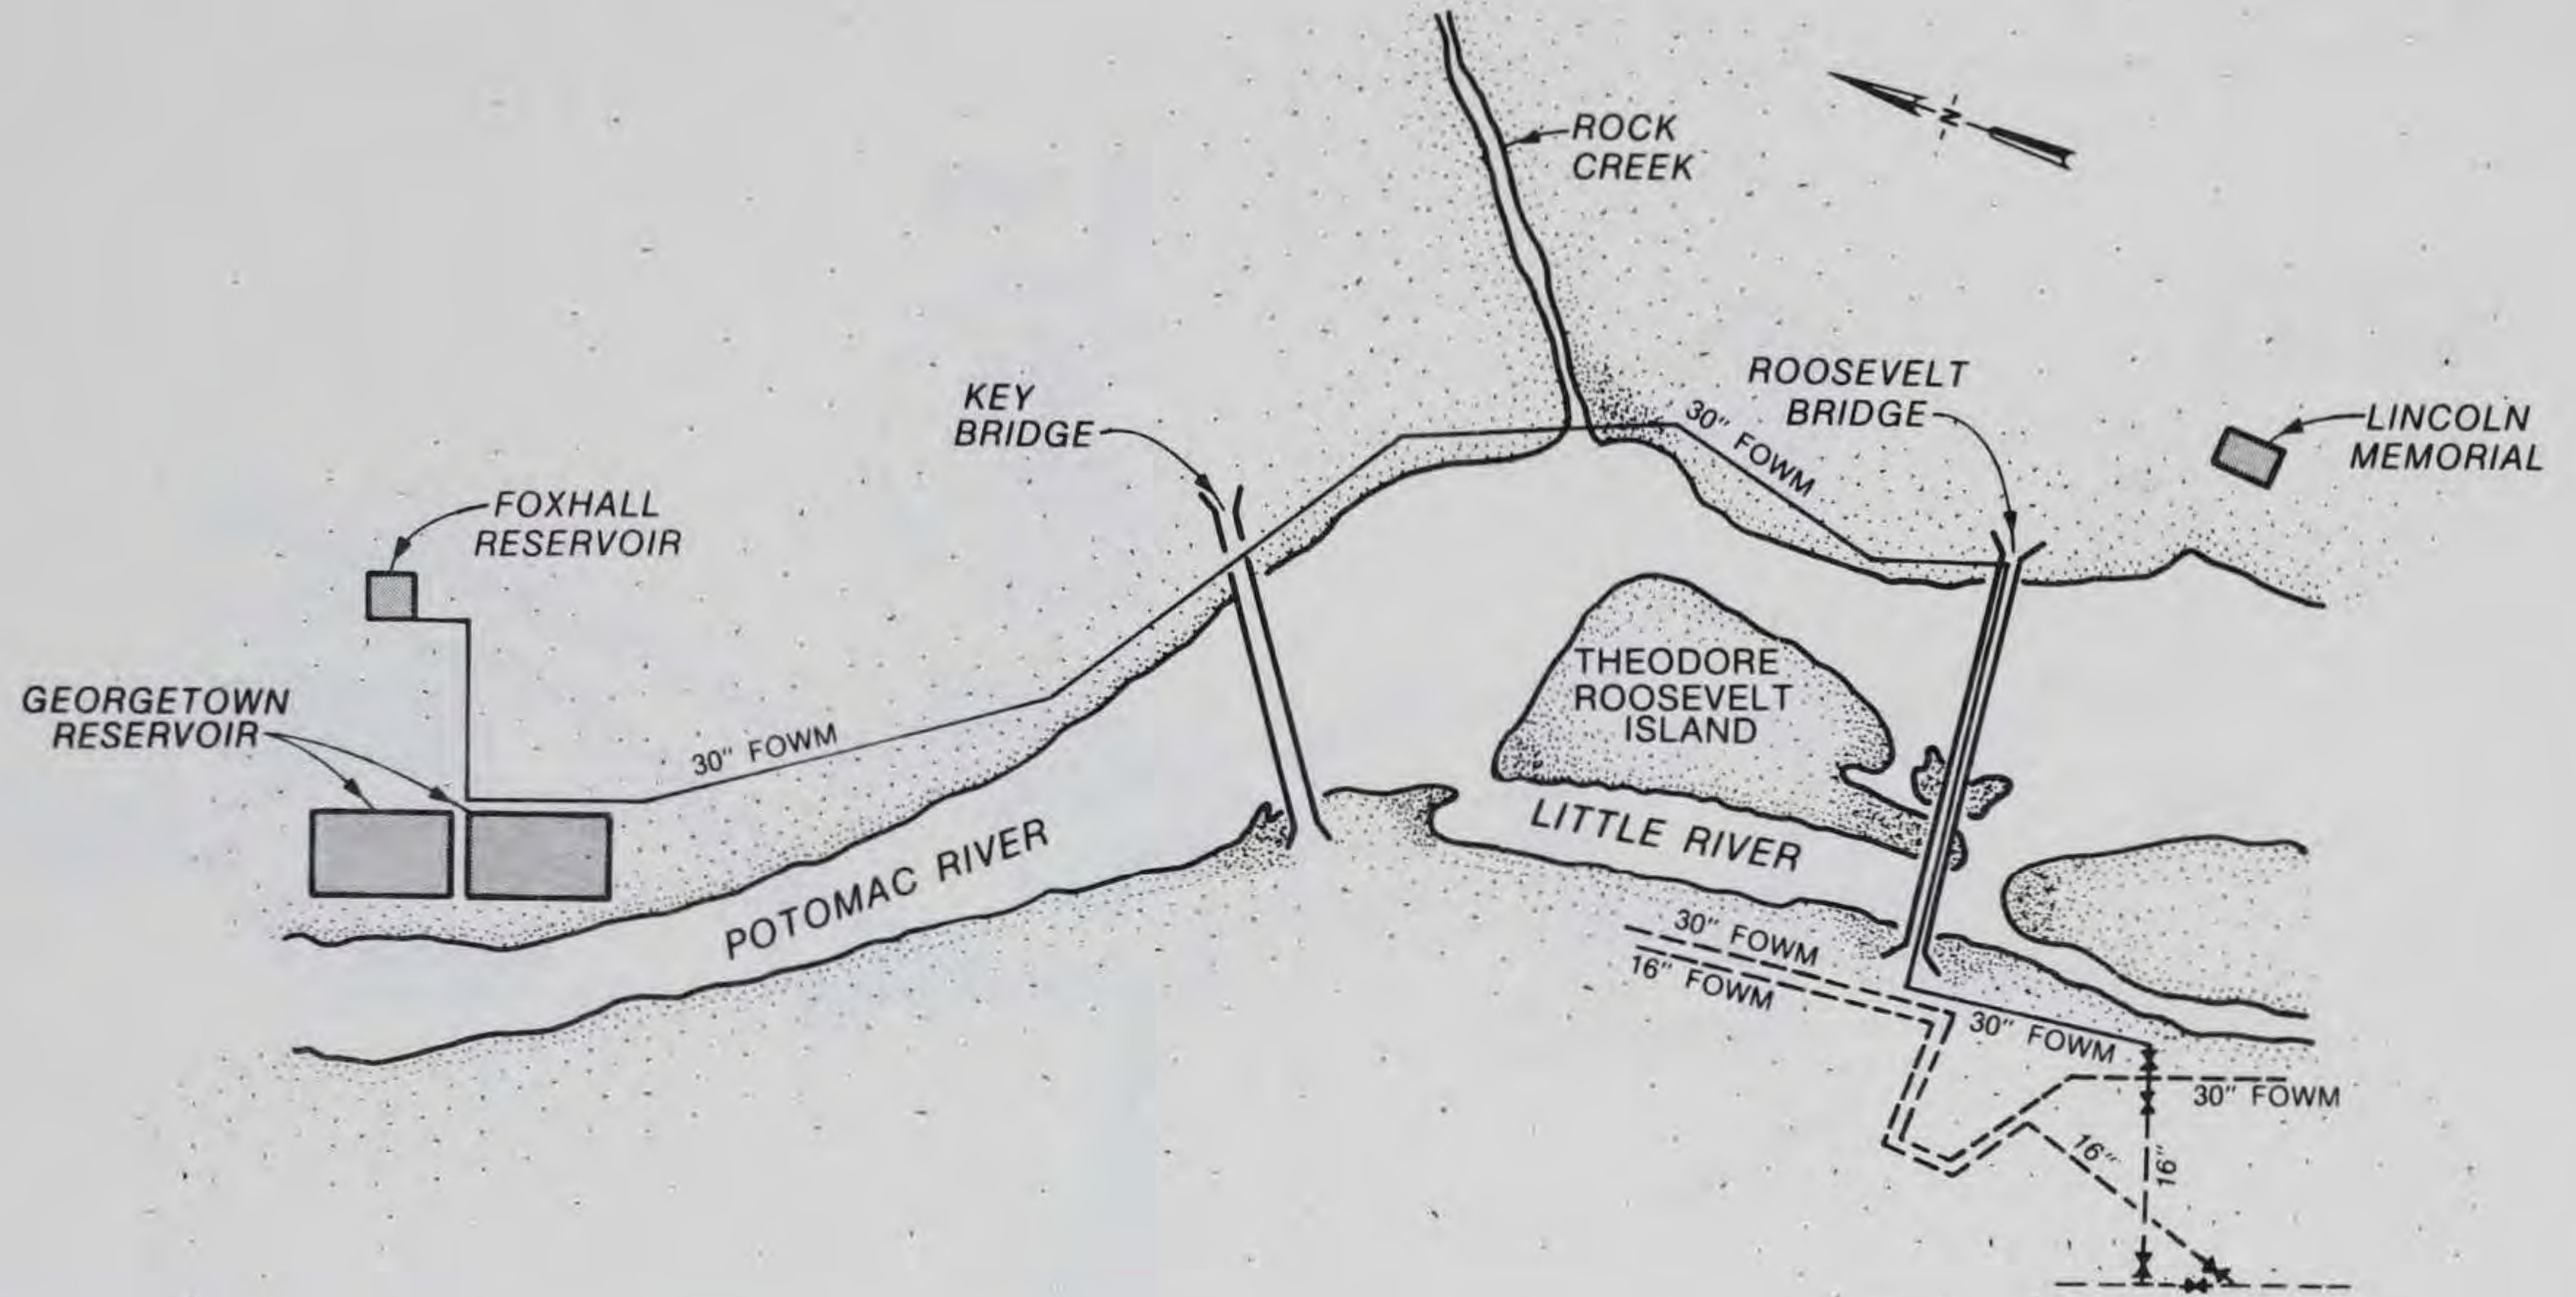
Detail of proposed Roosevelt Bridge river crossing
